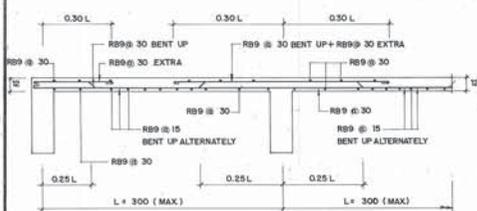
DETAIL OF PRESTRESSED CONCRETE GIRDER EXTRA REINFORCEMENT
